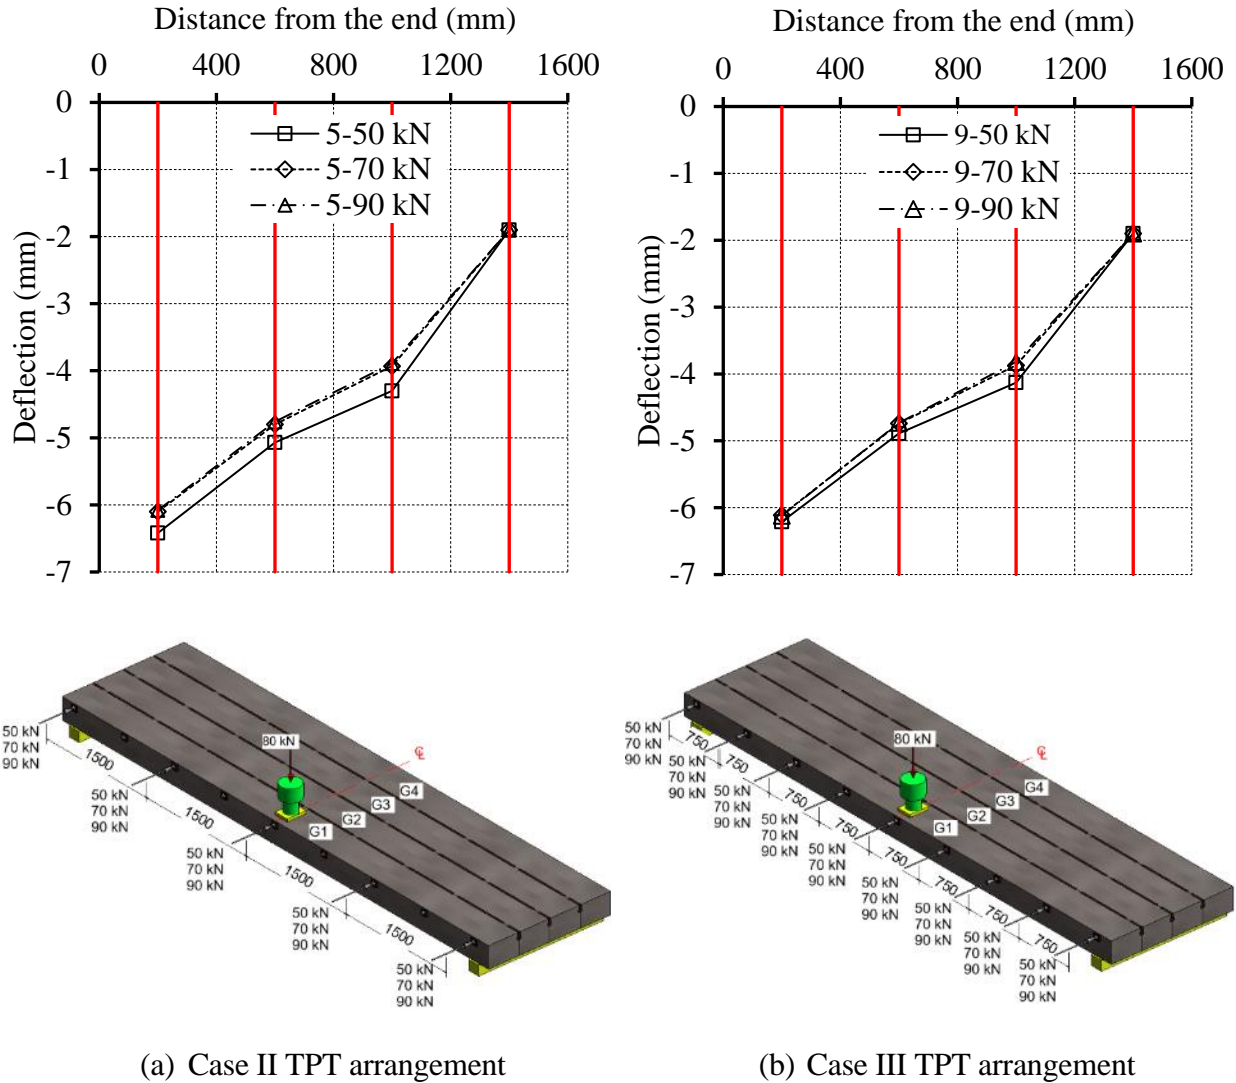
Mid-span deflection profile of the bridge model - girder G1 loaded.
